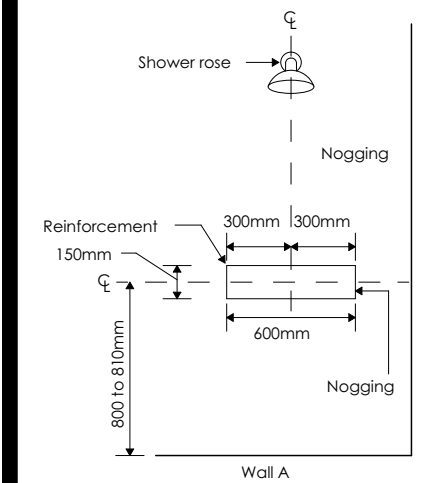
BELOW LOCATION OF SHEETING FOR SHOWER WALLS
